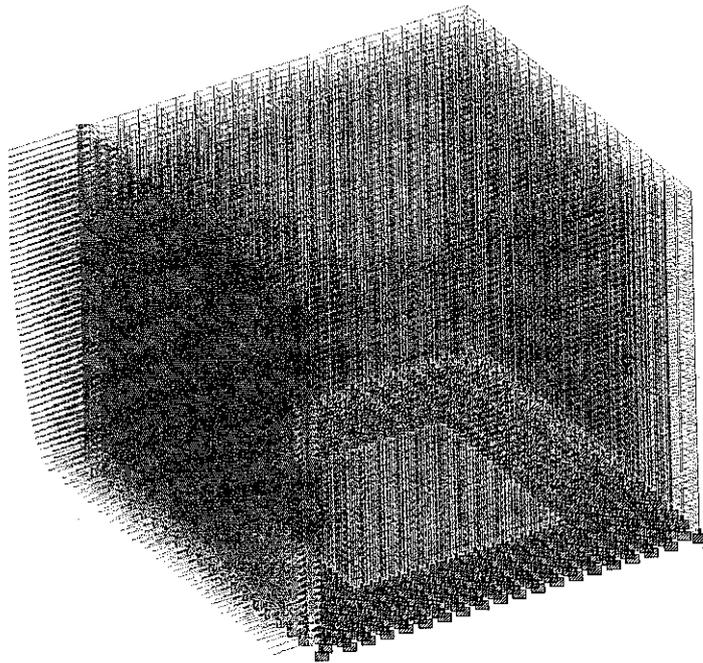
3-D Layout of the Structure with Wind Loading
